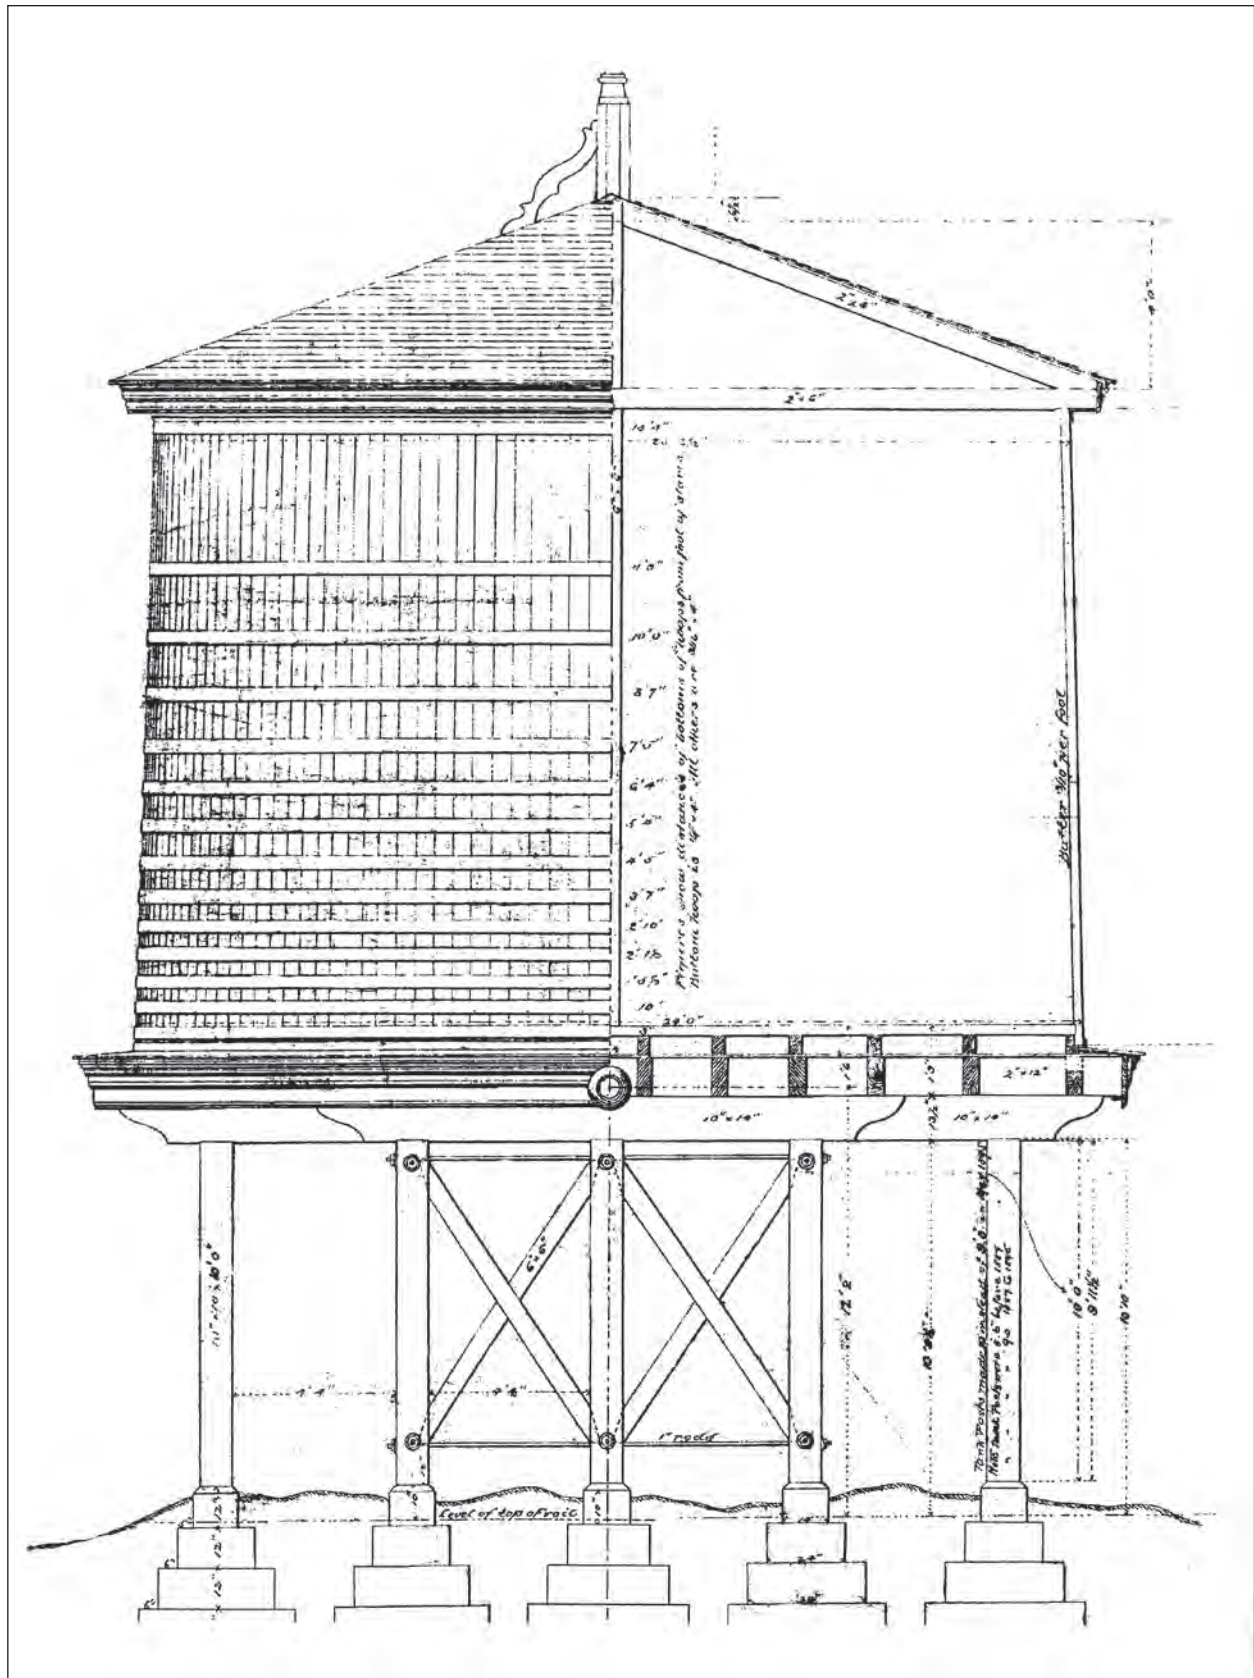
Water tank elevation from a tower built in 1880 (courtesy Russell Crump/Priest Library Kansas City, MO).
